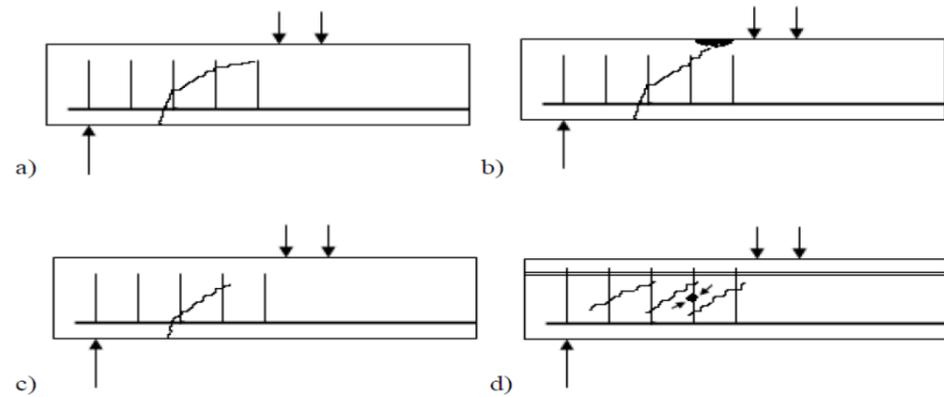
Possible shear fatigue failure modes in beams with shear reinforcement: a) fatigue of the stirrups, b) fatigue of the concrete in compression above the shear crack, c) fatigue of the longitudinal reinforcement crossing the shear crack and d) fatigue of the concrete in compression in the web (after Olsson and Pettersson, 2010).
